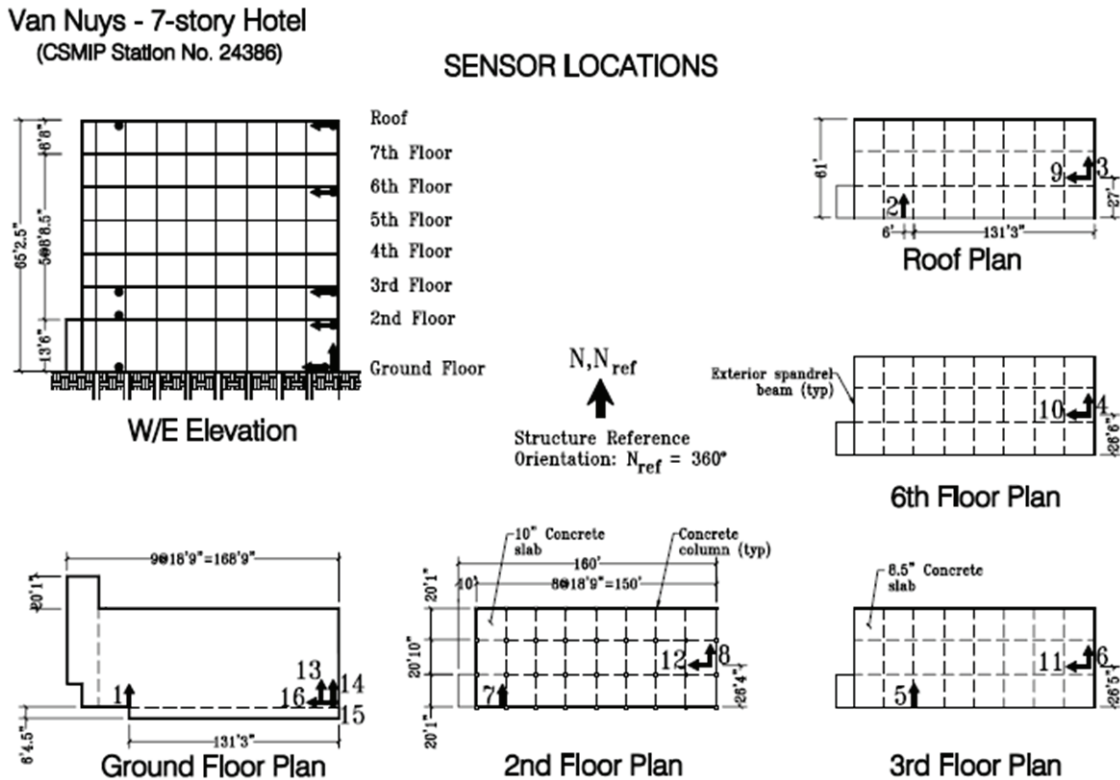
Elevation and Plan of Example Building, Location and Direction of Accelerometers
